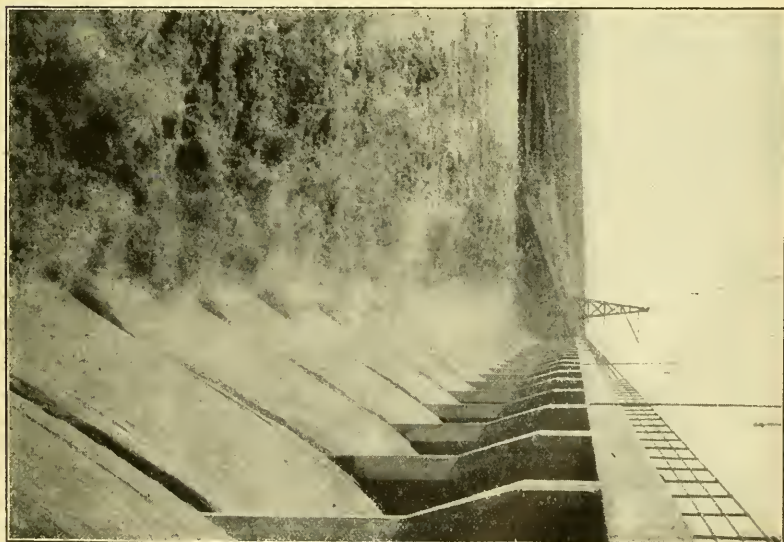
BASSANO DAM: OVERFLOW WITH 9.5 FT.
